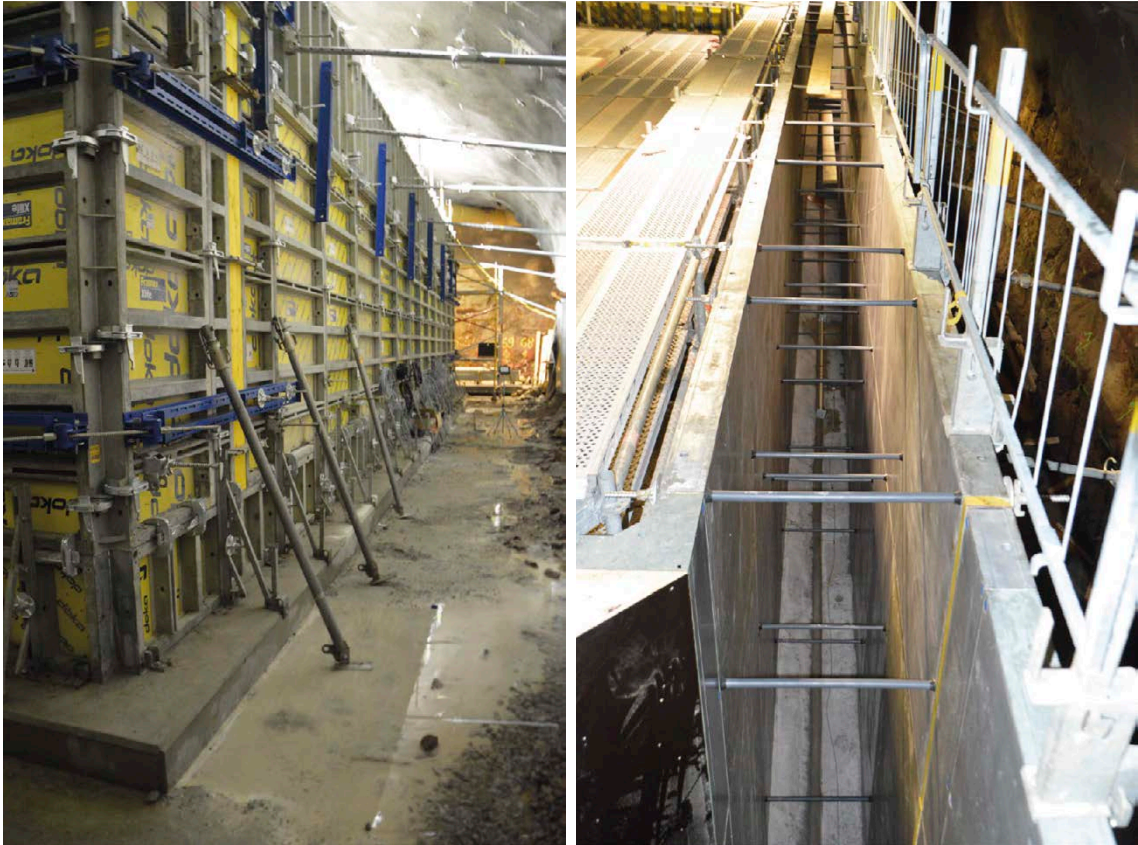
Outside (left image) with supports against adjacent rock wall and rock floor and inside of a traditional formwork utilising tie rods in order to keep the formwork together during casting. The images show the concrete caisson that constituted the final part of the development programme and which was constructed at the Äspö Hard Rock Laboratory (Mårtensson and Vogt 2020).
